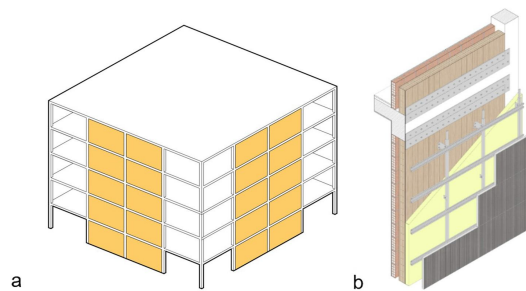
(a) An example of a building layout with CLT infill shear walls; (b) An example of CLT infill panel with a hooked external skin (ventilated façade) for the integrated seismic and energy retrofit [6]
